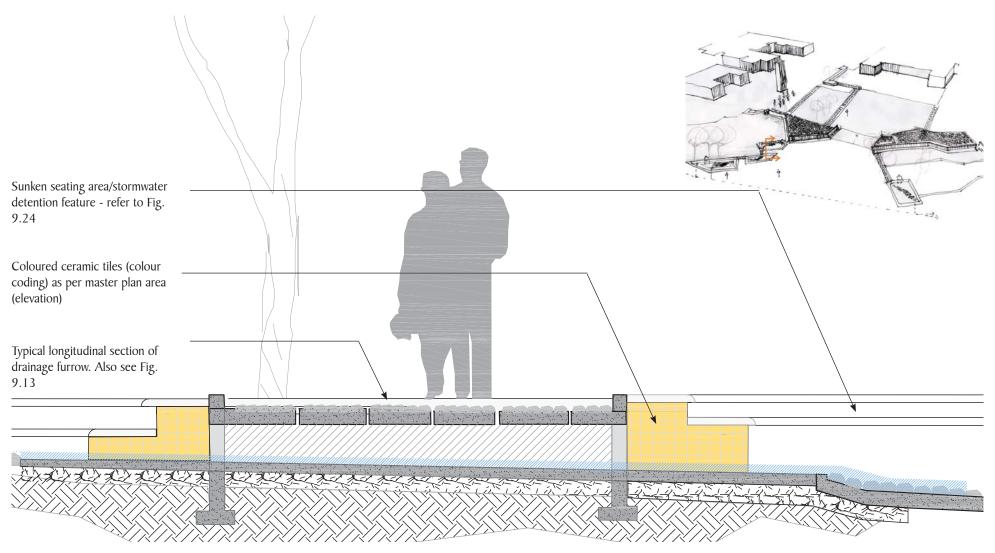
22: Drainage of water from one detention structure to the next. (Author, 2008) Scale 1:20
